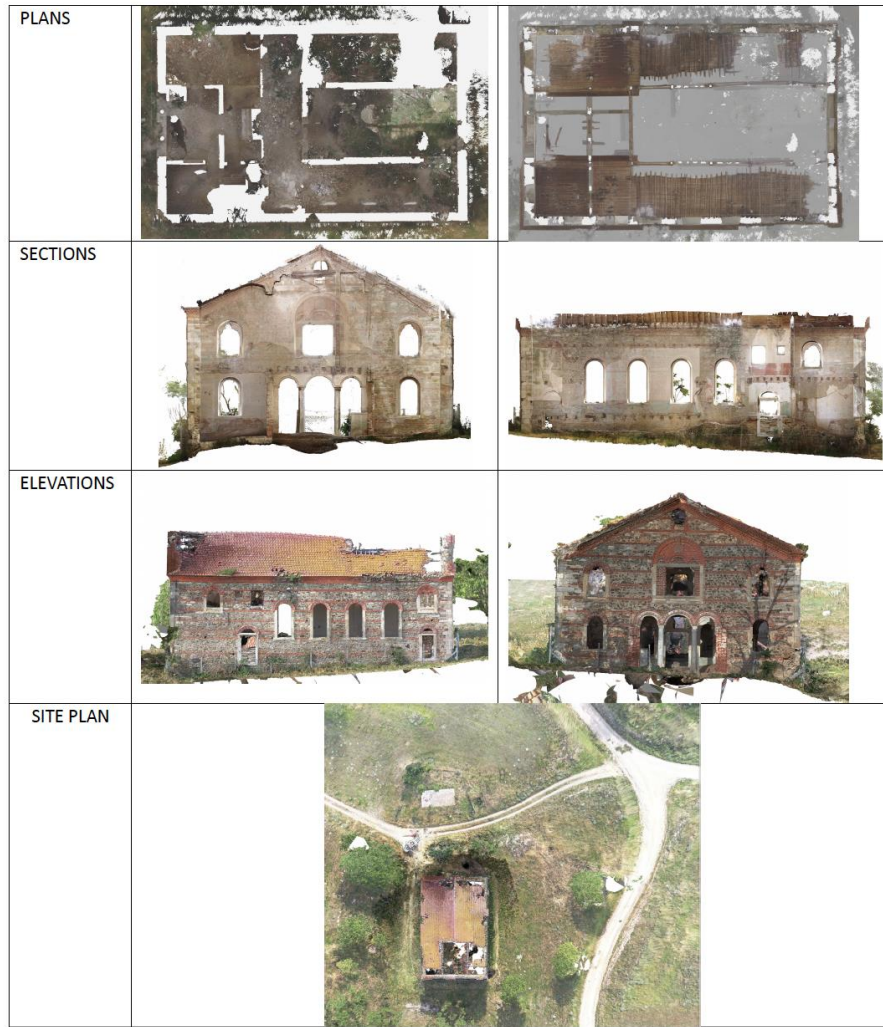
Germiyan Church Plans, Sections, Elevations, and Site Plan Orthophotos
